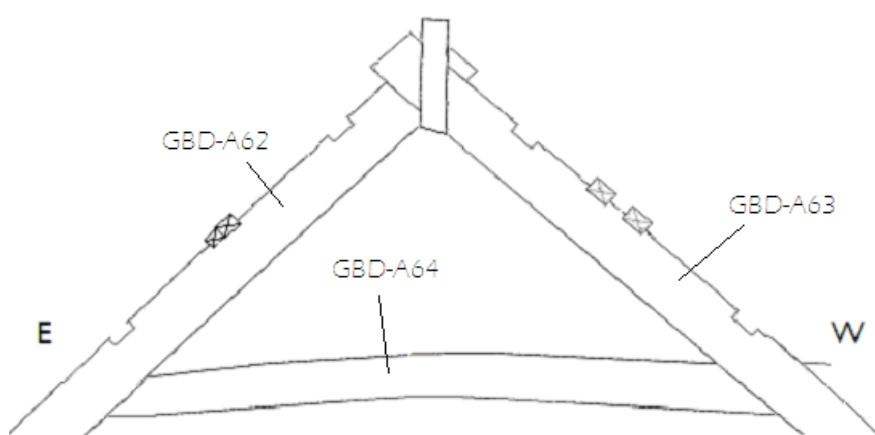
West range; sketch of truss 3, showing the location of samples GBD-A62–4
